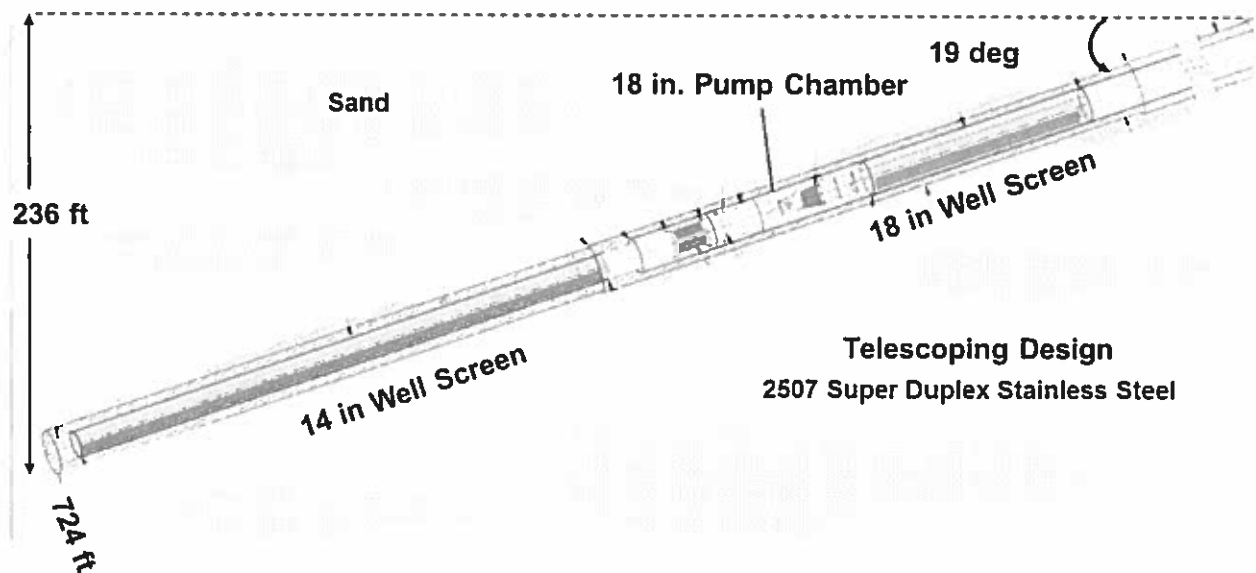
Telescoping design showing larger pump house casing used in the Monterey test slant well
